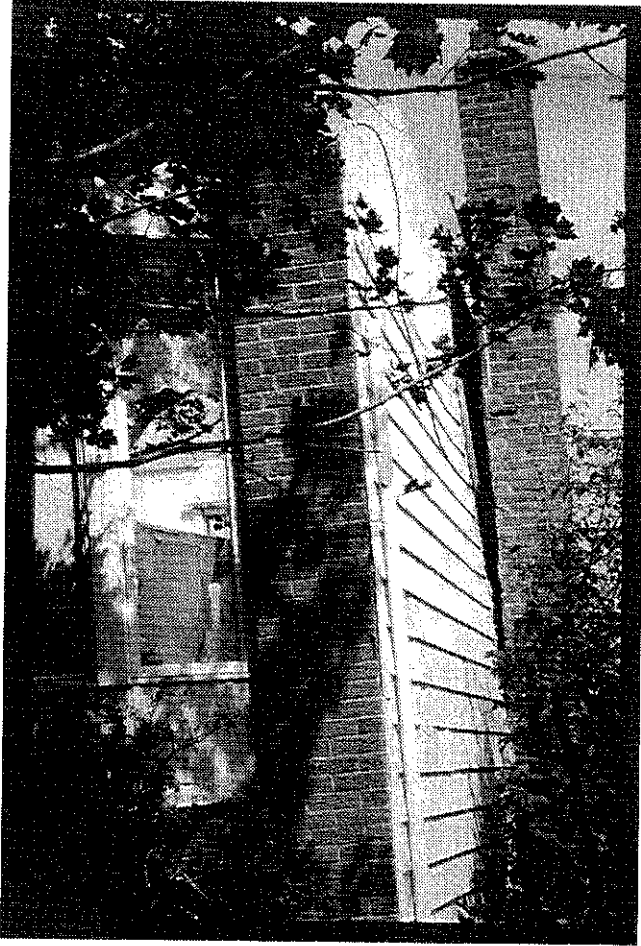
South wall of house in Figure 9, leaning left away from chimney, which is still plumb.
